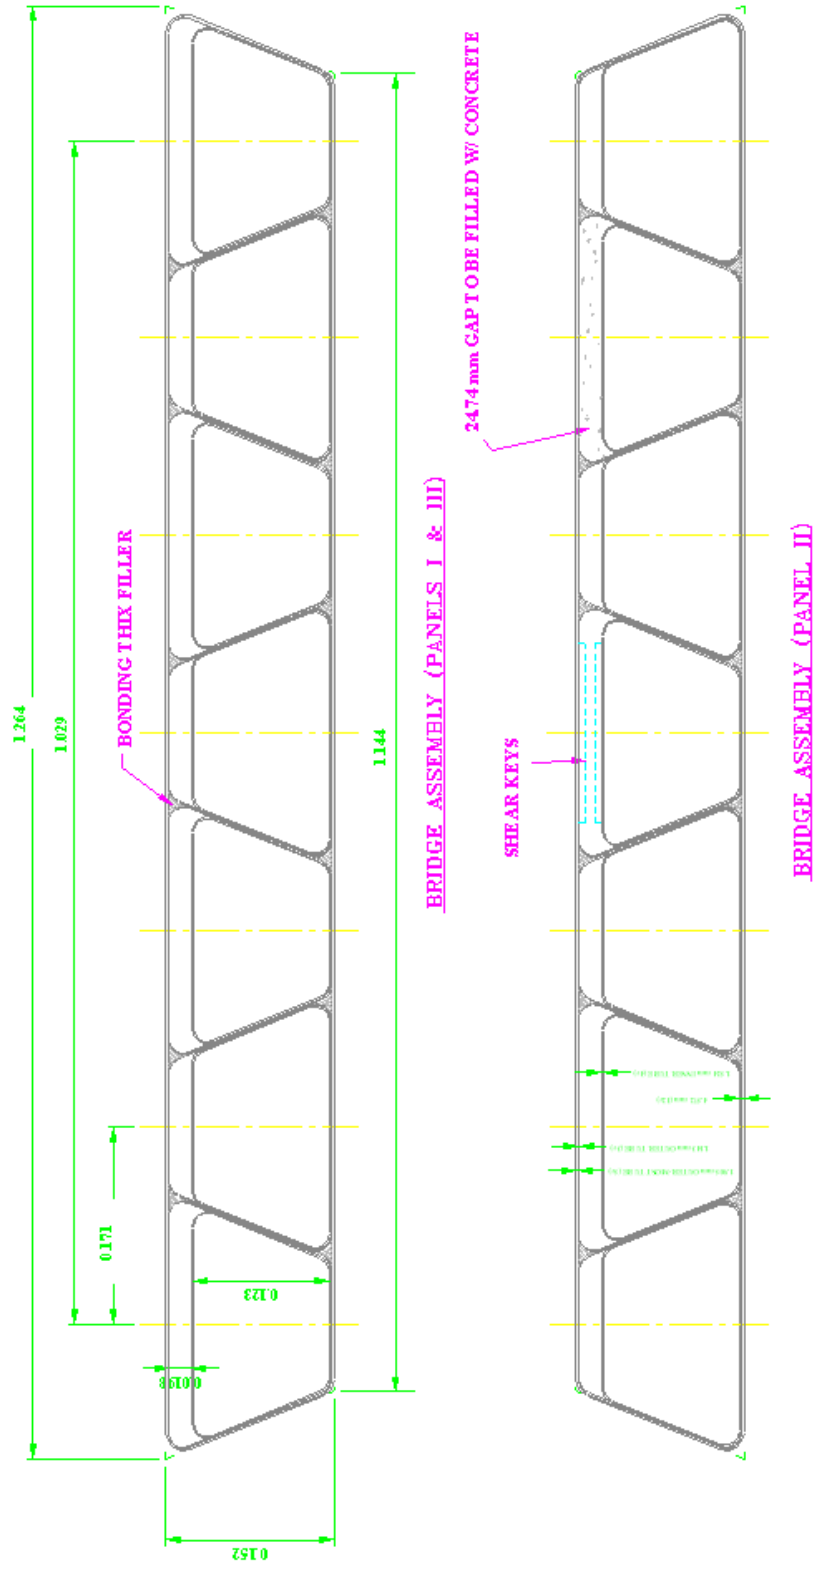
Cross Section of the 3/4 Scale Model of a Hybrid FRP-Concrete Bridge Deck Panels (units in mm)
